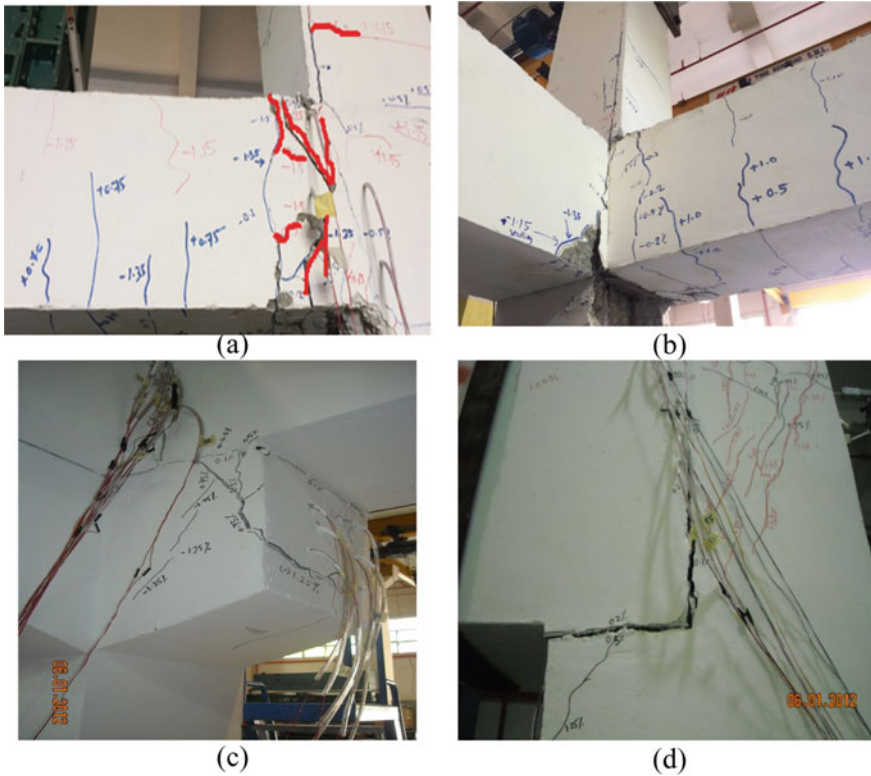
Comparison of overall visual observation of damages on corner beam-column joint with and without fuse bars; (a) vertical cracks on beam-column interface with fuse bars; and (b) vertical cracks on beams +1.75% drift, (c) diagonal cracks at corbels without fuse bars, and (d) vertical and horizontal gaps of 25 mm at beam-column interface without fuse bars.
